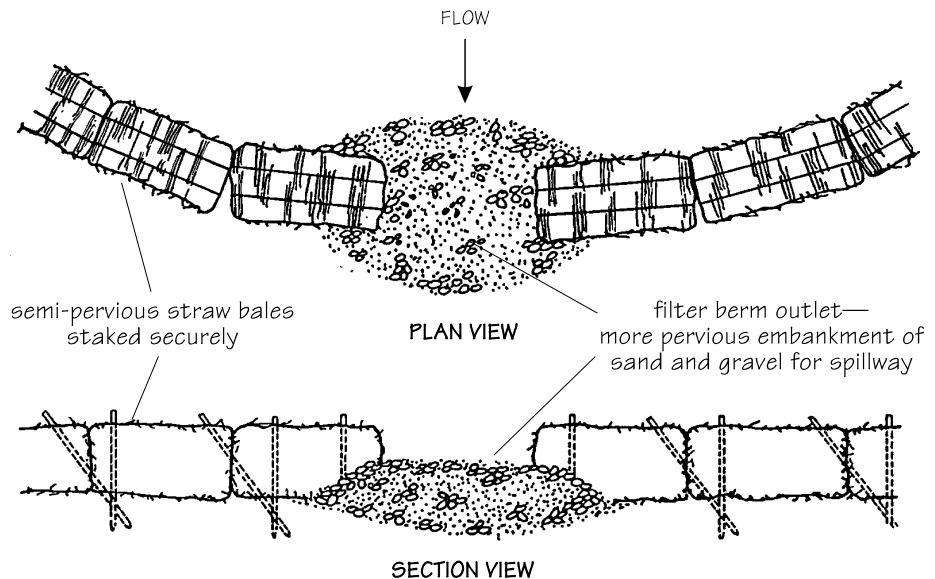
Details of construction for a straw-bale barrier combined with a gravel check dam. (Adapted from Idaho Department of Lands, 1992.)
